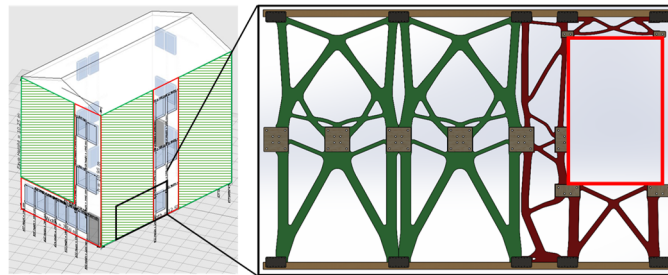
Assembly of a 3-storey MDH building wall section with structural modules (green bodies) and non-structural modules supporting a window (red bodies and red frame)
